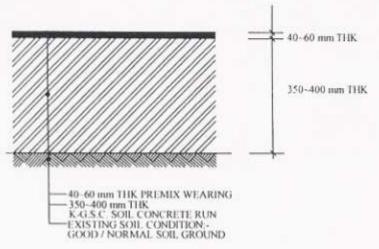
DETAIL OF ROAD PROPOSED CONSTRUCTION DESIGN OF K-G.S.C. METHOD FOR EXPANSION JOINT
